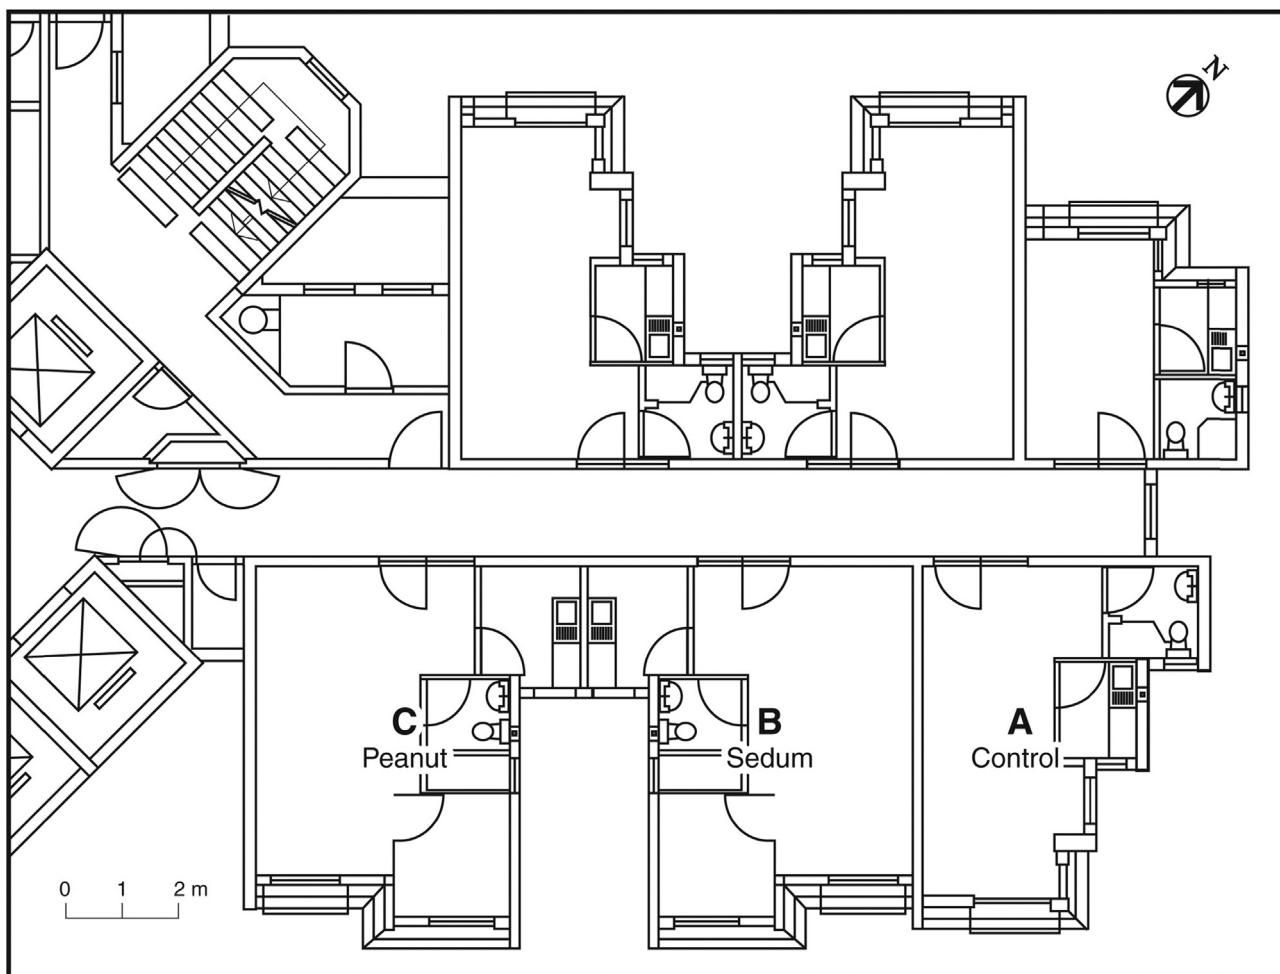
The three experimental plots on the rooftop of the high-rise building which matches the three domestic flats situated below them.
